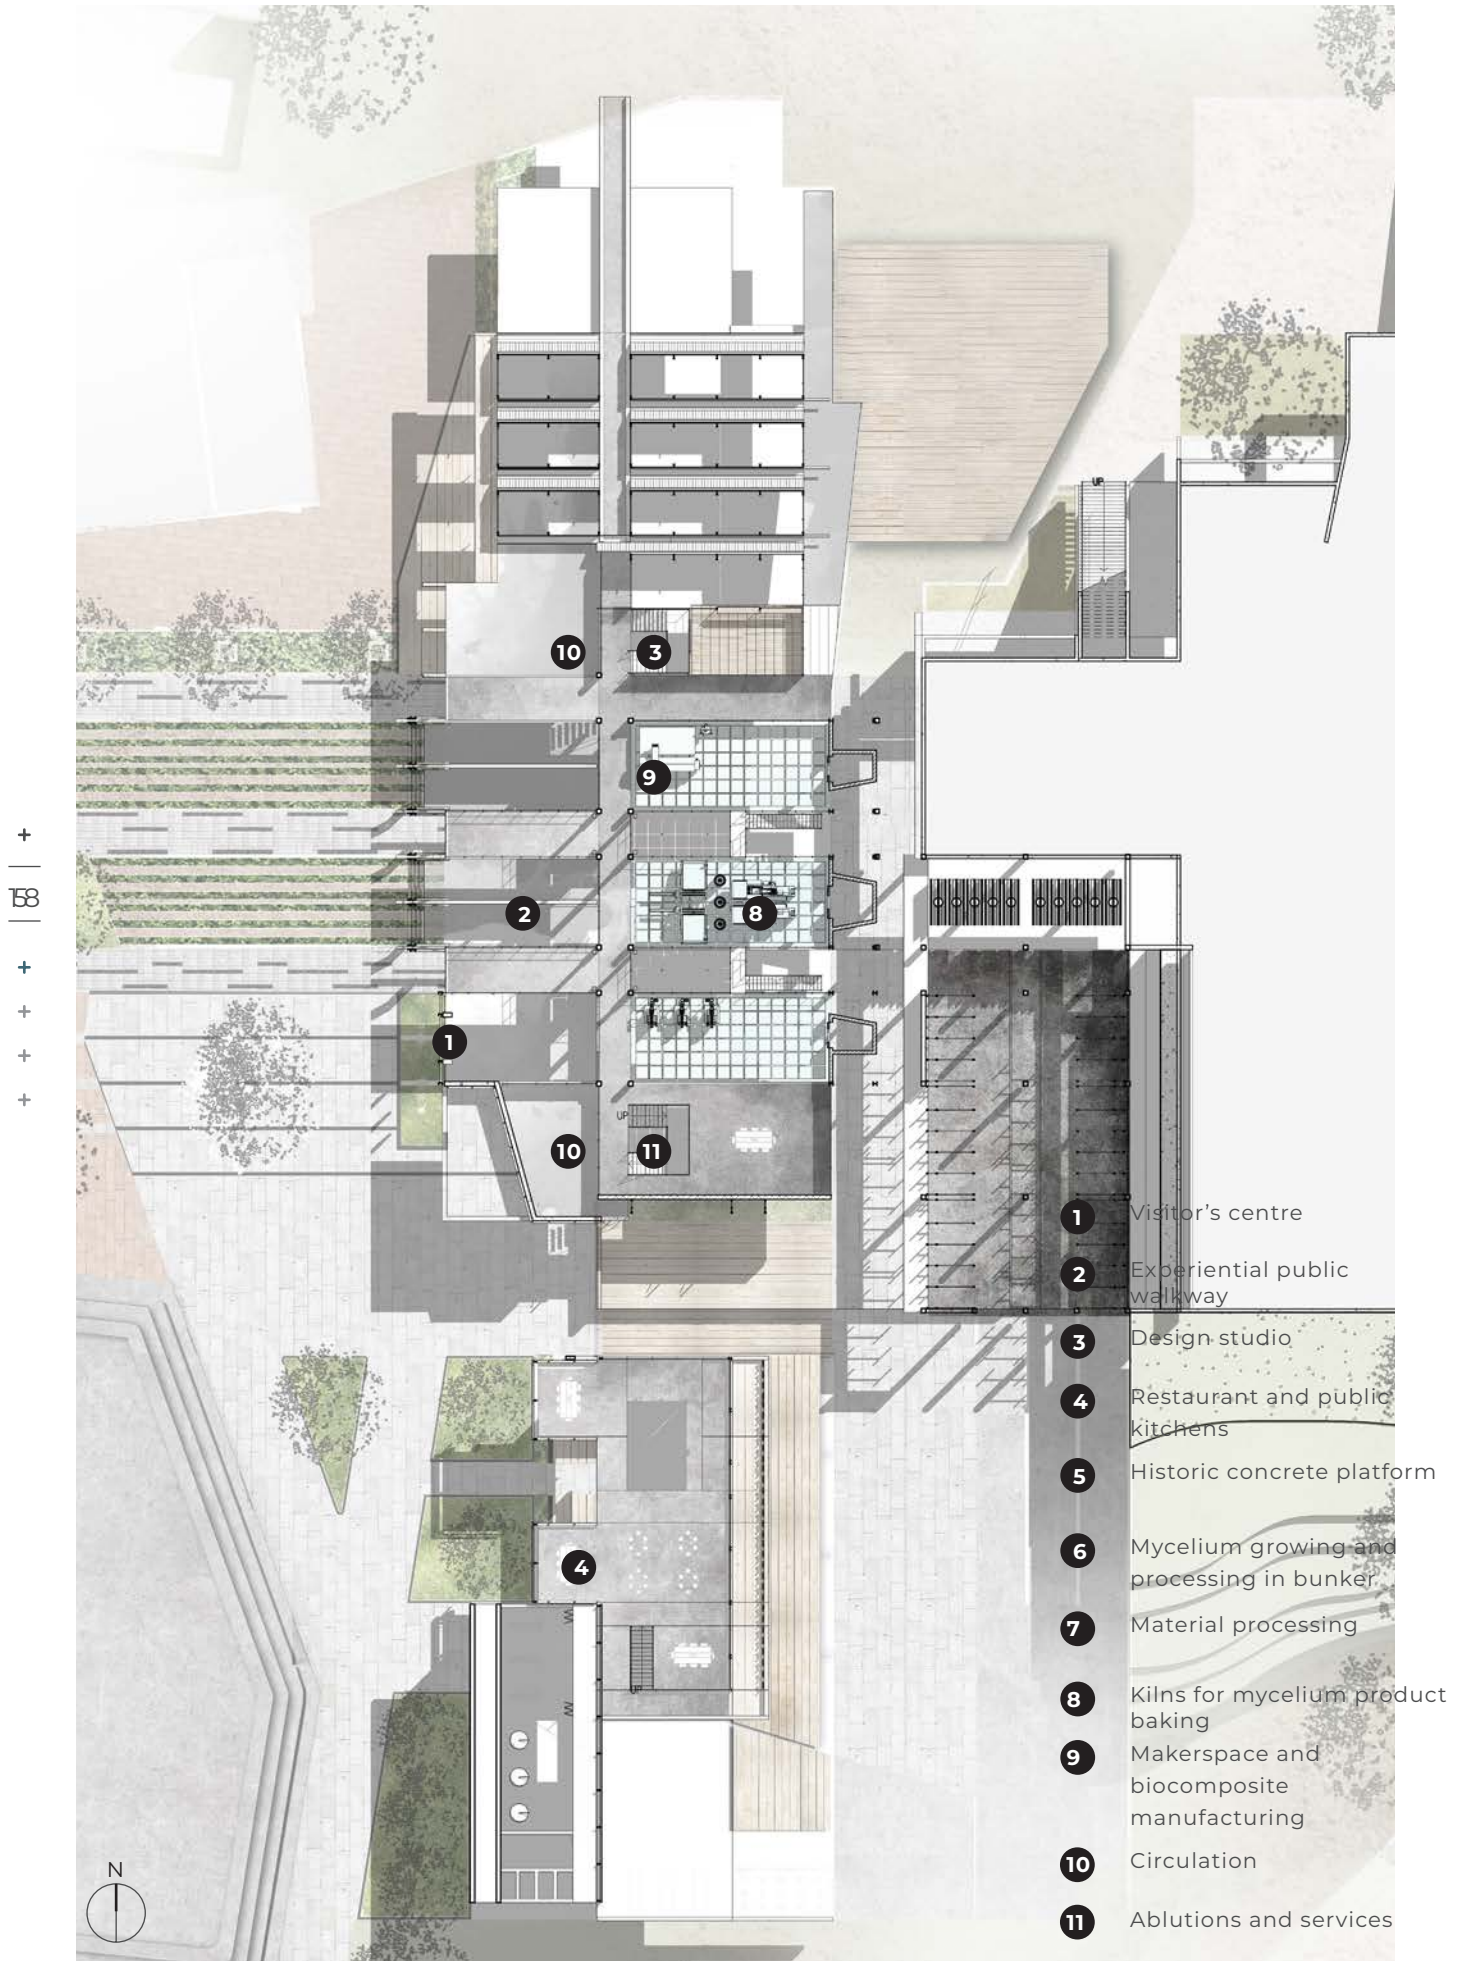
First floor plan (Scale 1:500, original drawing 1:200) (Author:2018)
